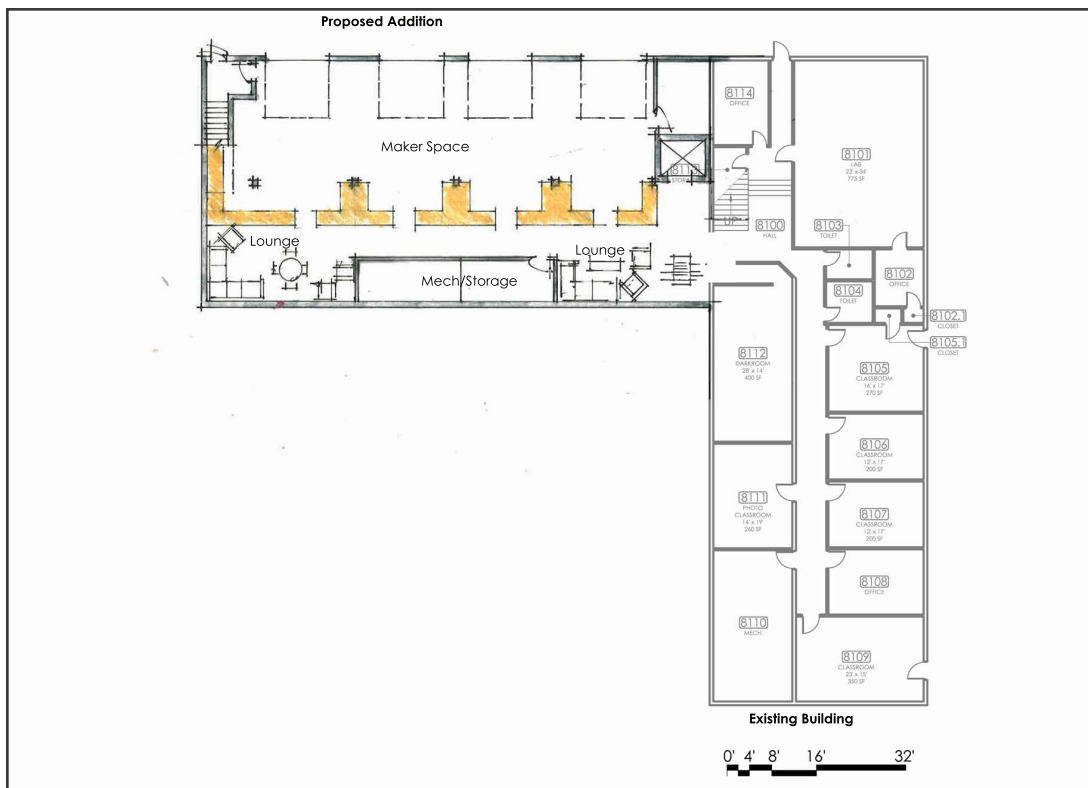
Possible Reynolds Basement Floor Plan
